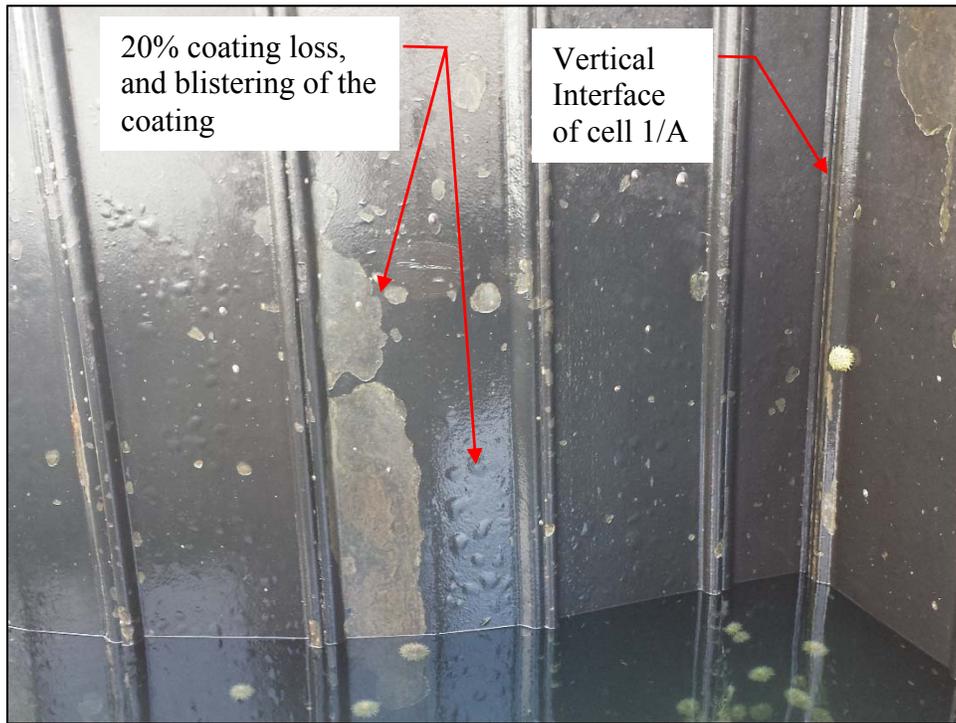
Interface of sheet pile cell 1/A on north face at low water.
